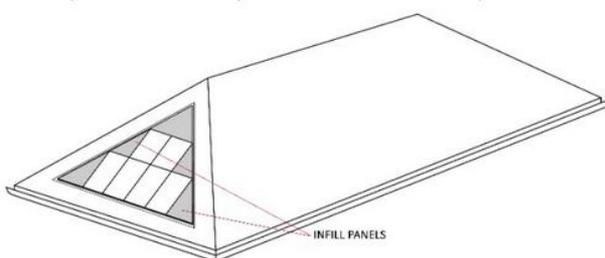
Example of Trapezoidal Solar Array on a Triangular Roof Plane
